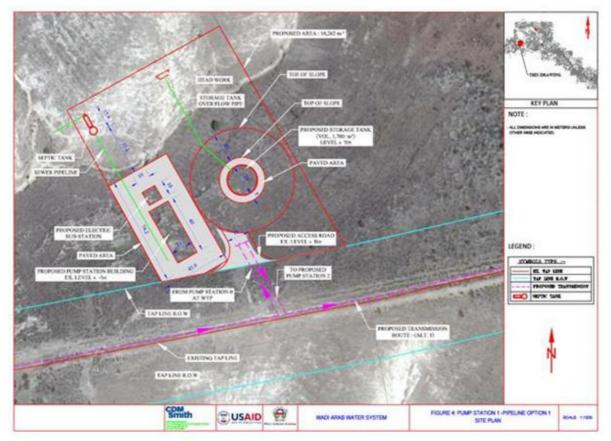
Pump Station 1 -Pipeline Option 1 Site Plan
